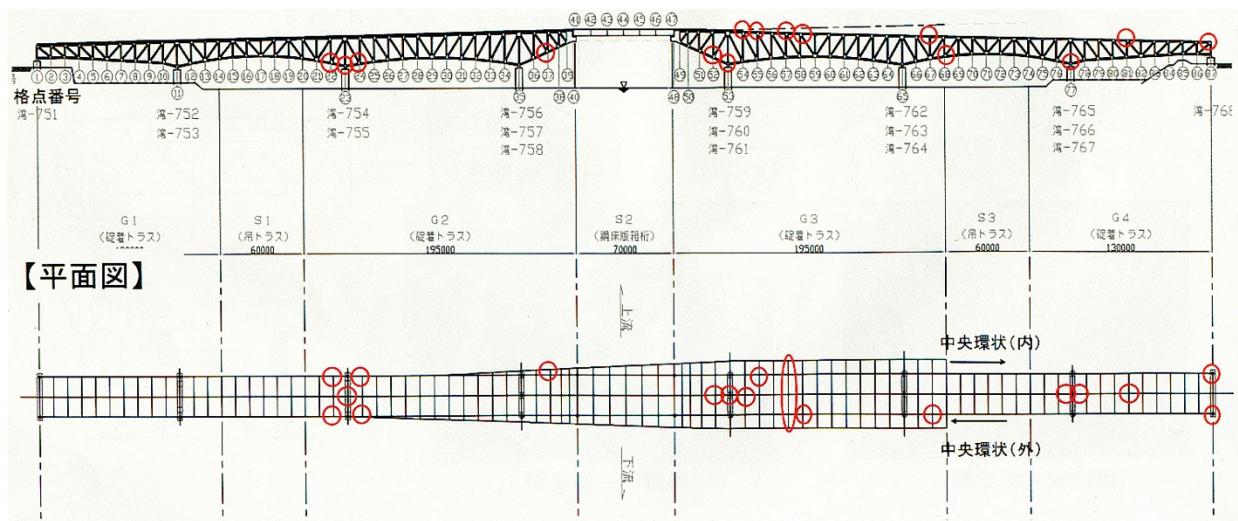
Drawing of the Kosoku-Arakawa Bridge showing locations of gusset plate damage
